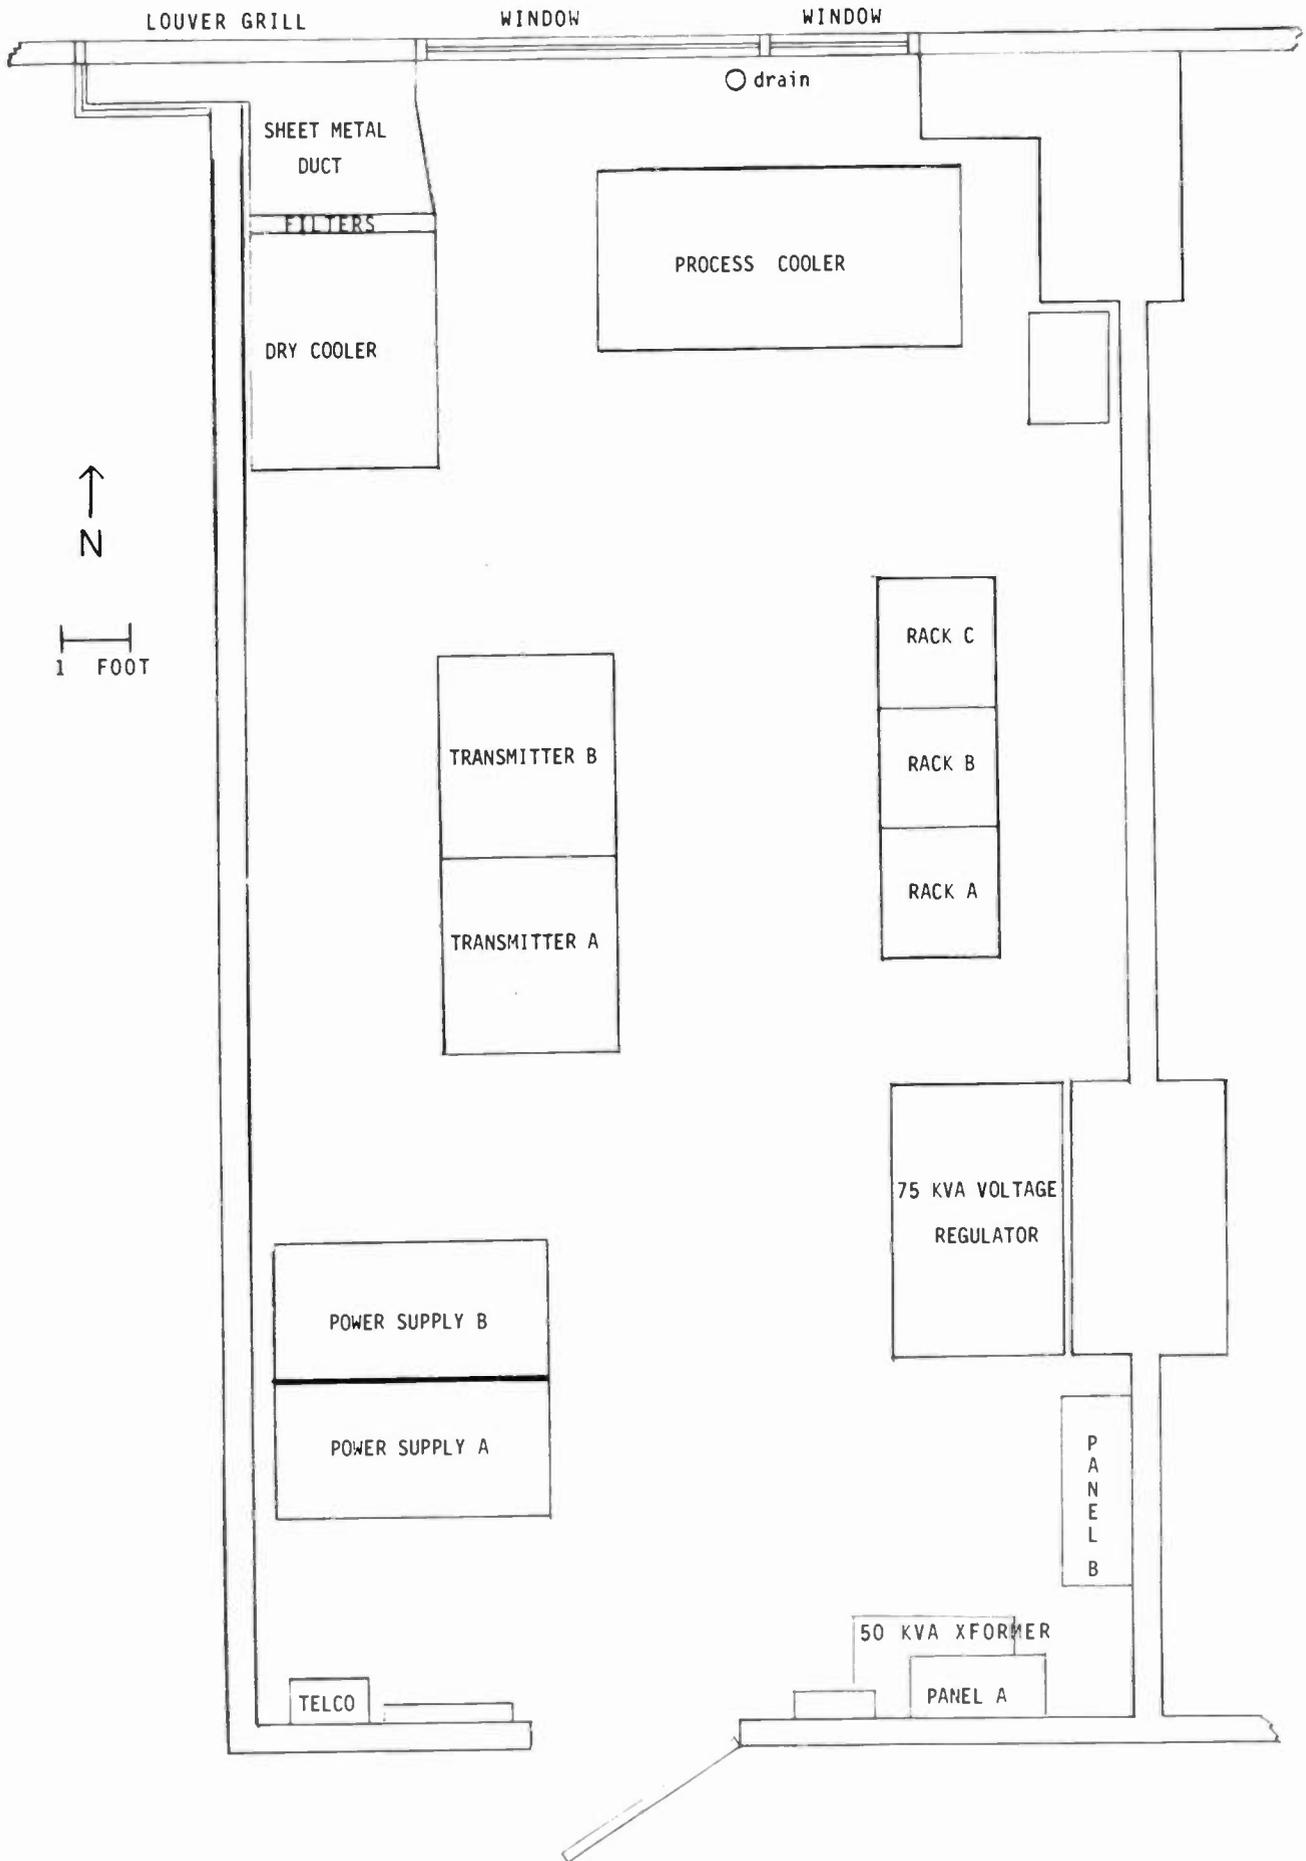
WFYR TRANSMITTER ROOM FLOOR PLAN - SEARS TOWER
